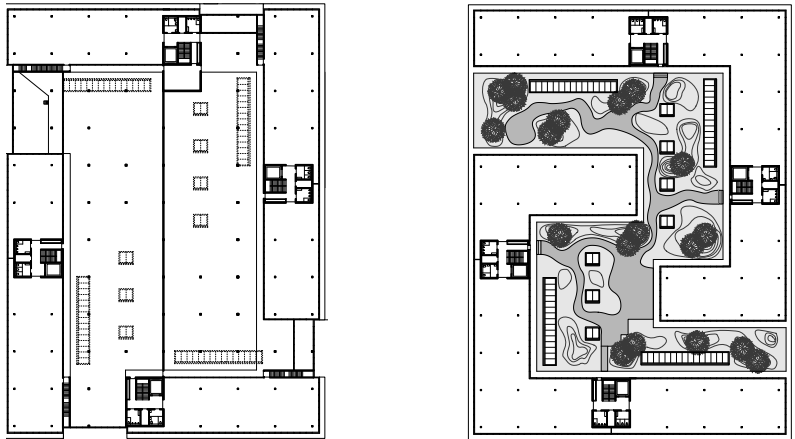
Plan of the ground floor and of the upper floors. Tracés 10/2019.
